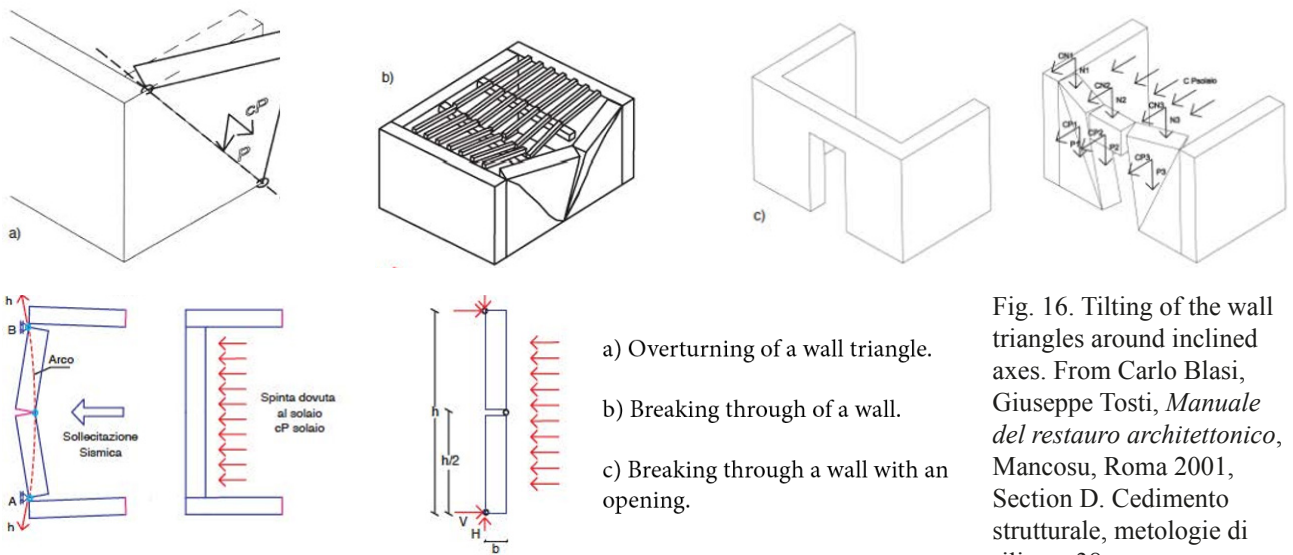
Tilting of the wall triangles around inclined axes. From Carlo Blasi, Giuseppe Tosti, *Manuale del restauro architettonico*, Mancosu, Roma 2001, Section D. Cedimento strutturale, metologie di rilievo, 38.
